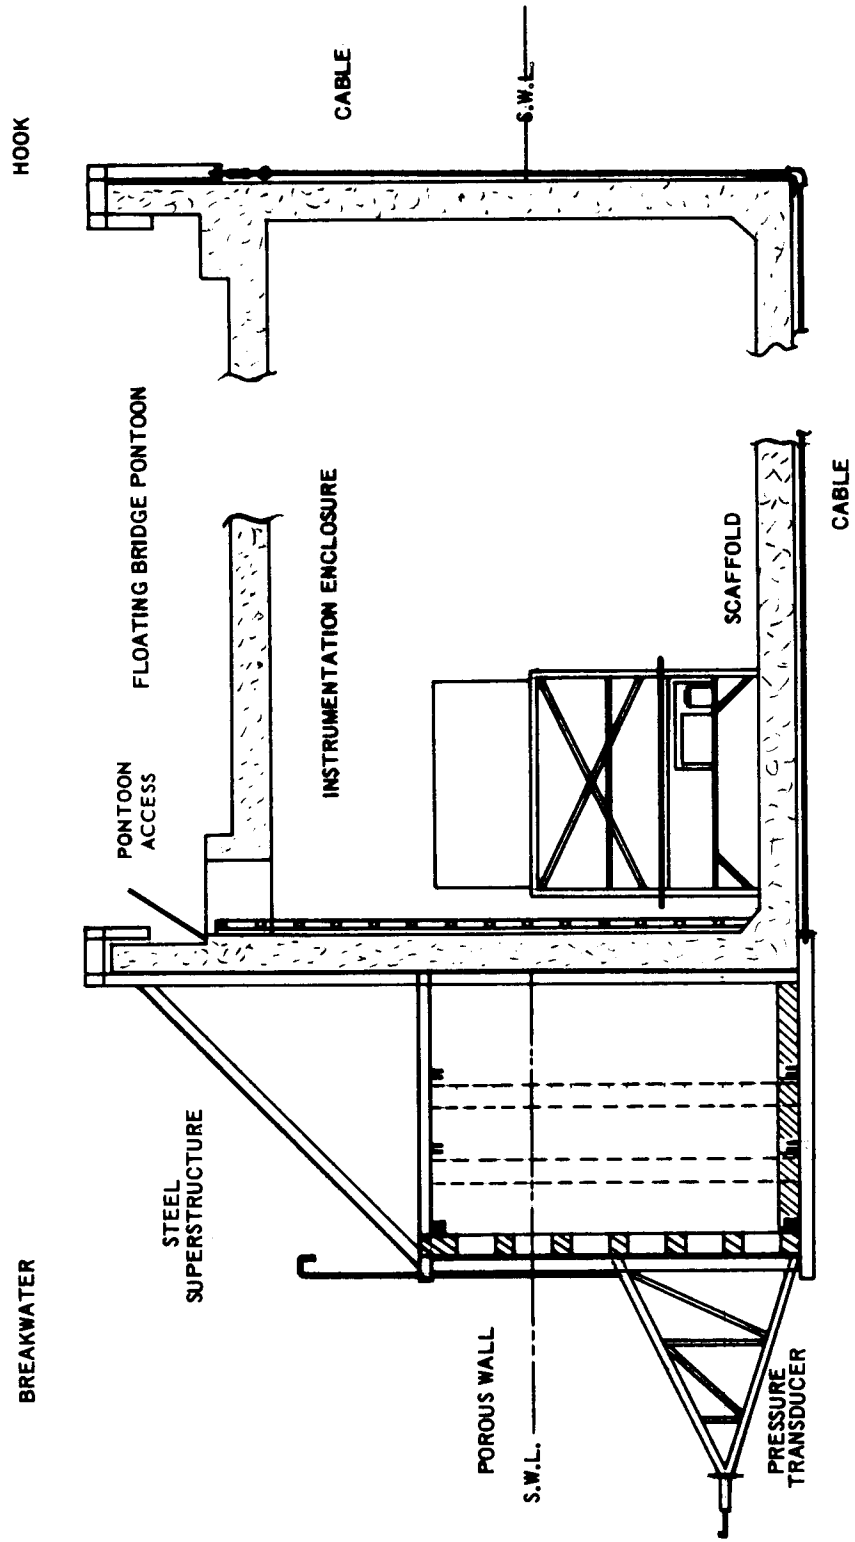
Cross-Section A-A Of Breakwater Attached To Floating Bridge Pontoon.
